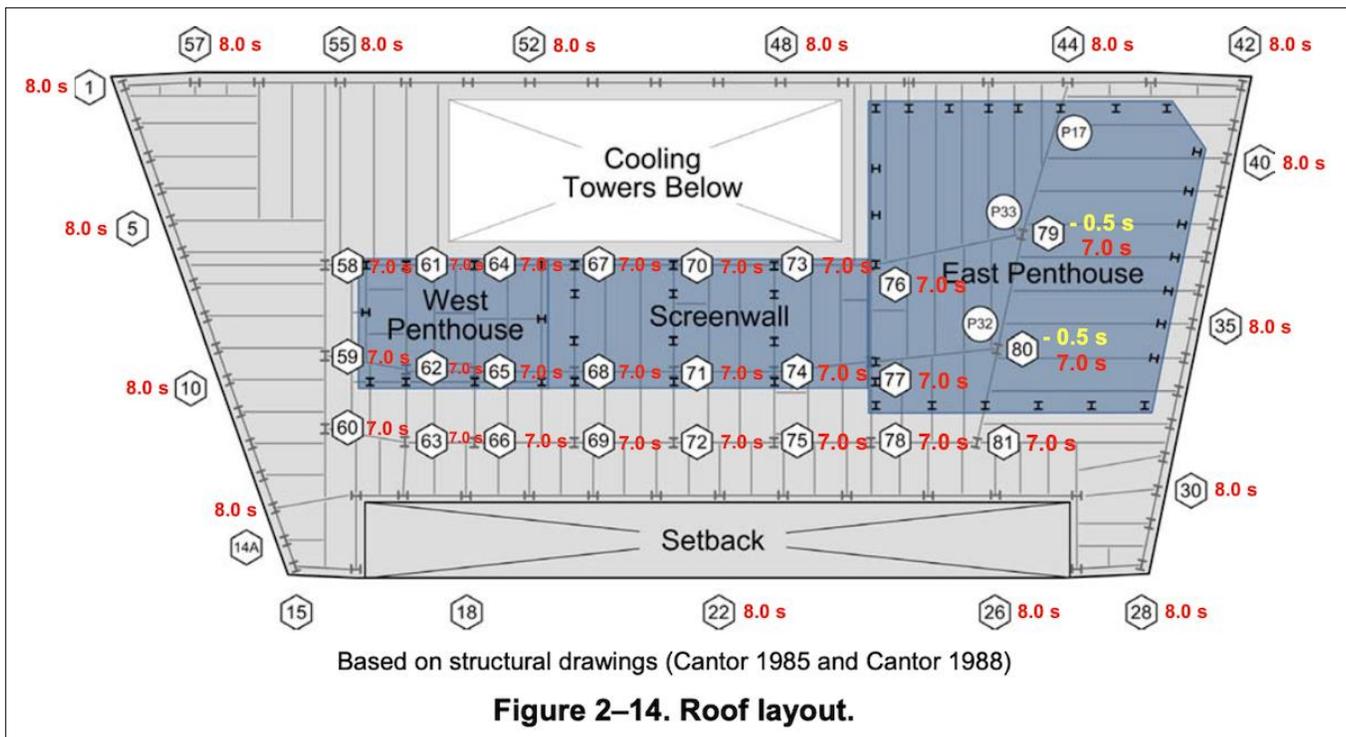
Hypothesized column failure sequence with estimated approximate failure times. Yellow indicates column failures high in the building. Red indicates column failures low in the building.
